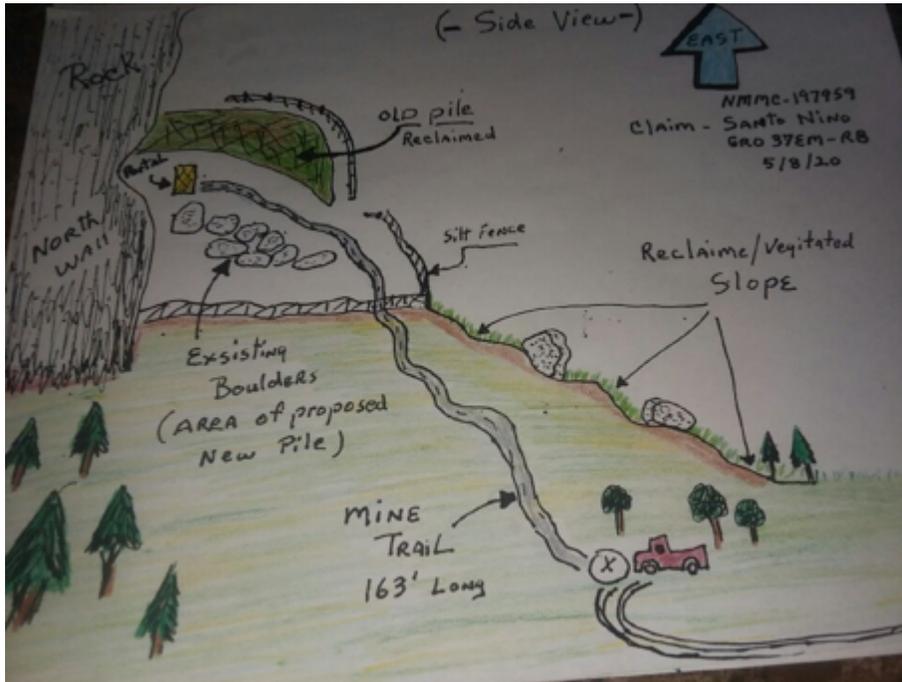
Exhibit A: Drawing showing Access Trail, Reclaimed/Vegetated Slope, Old Pile (reclaimed) and Existing Boulders (Proposed new pile)
